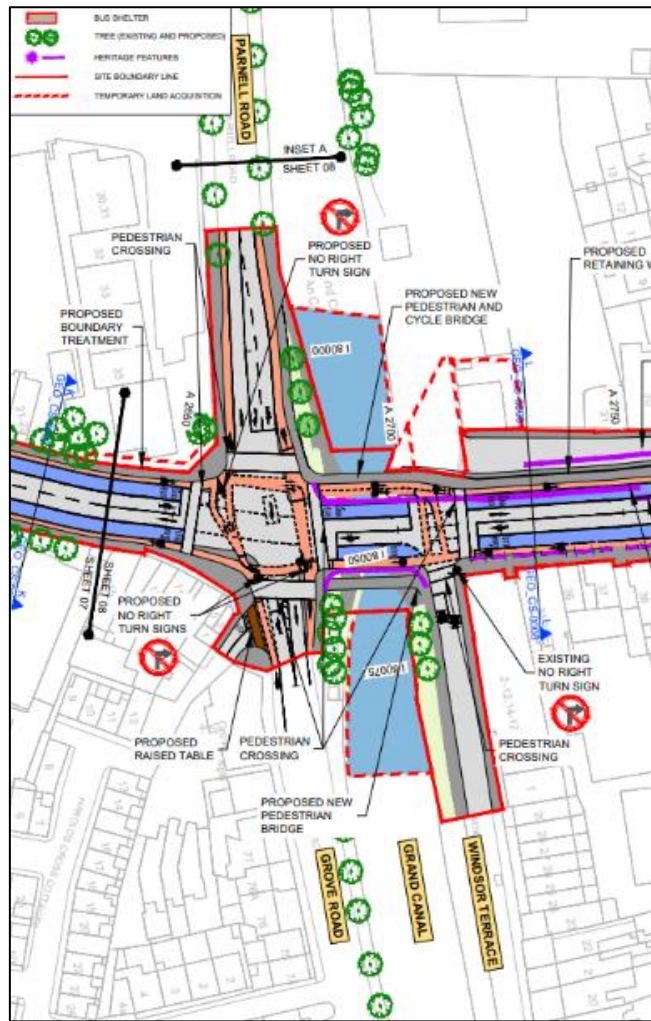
Extract from General Arrangement Drawings (Sheet 8)
